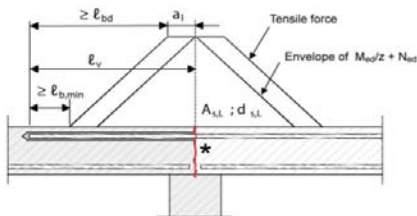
End anchoring of slabs or beams, designed as simply supported.
